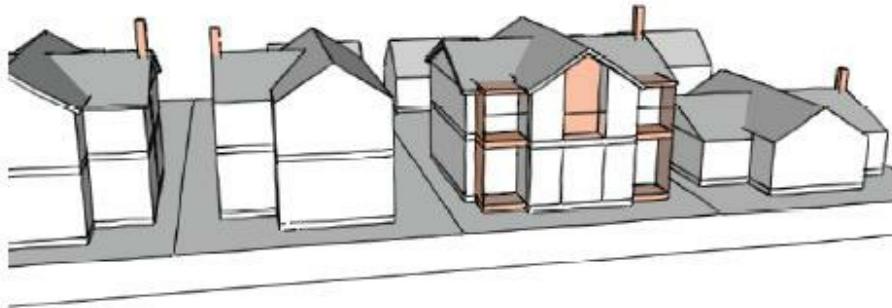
Typical Allotment Layout of a Detached Villa (indicative only — Layout and size may change)
